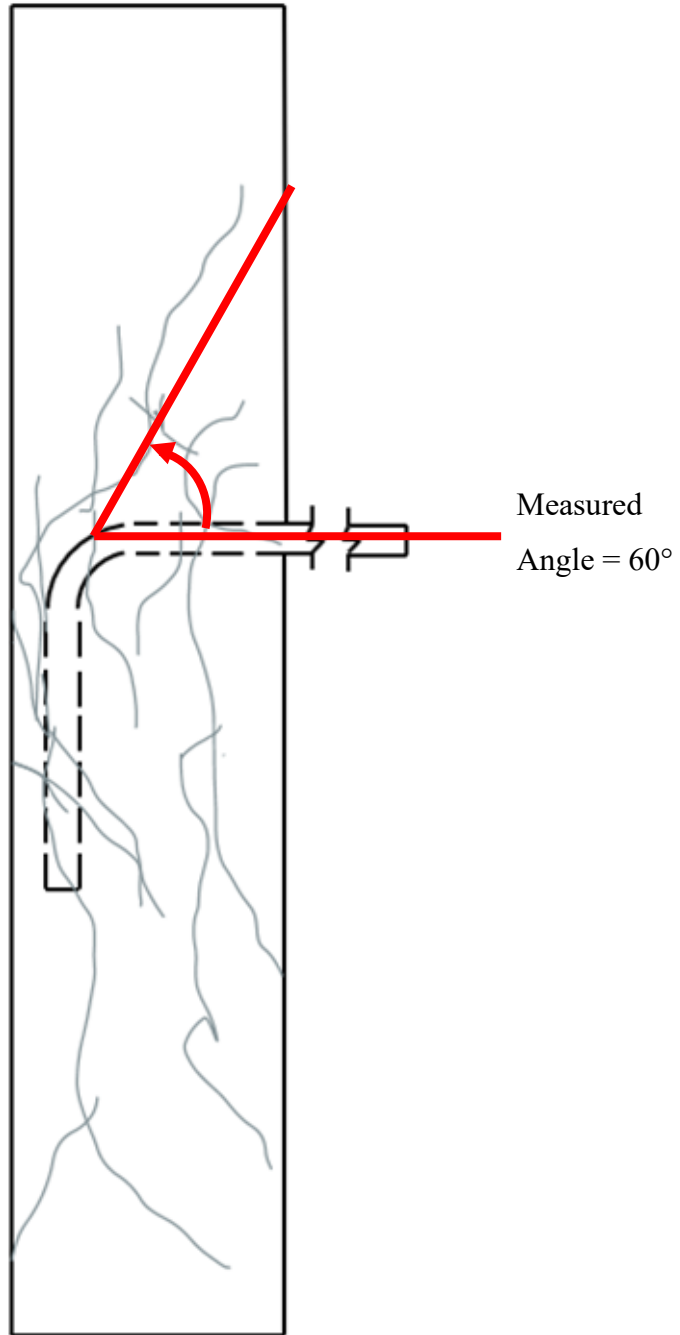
Crack pattern at maximum normalized tensile load for the east face of the beam-column joint specimen P1-90
